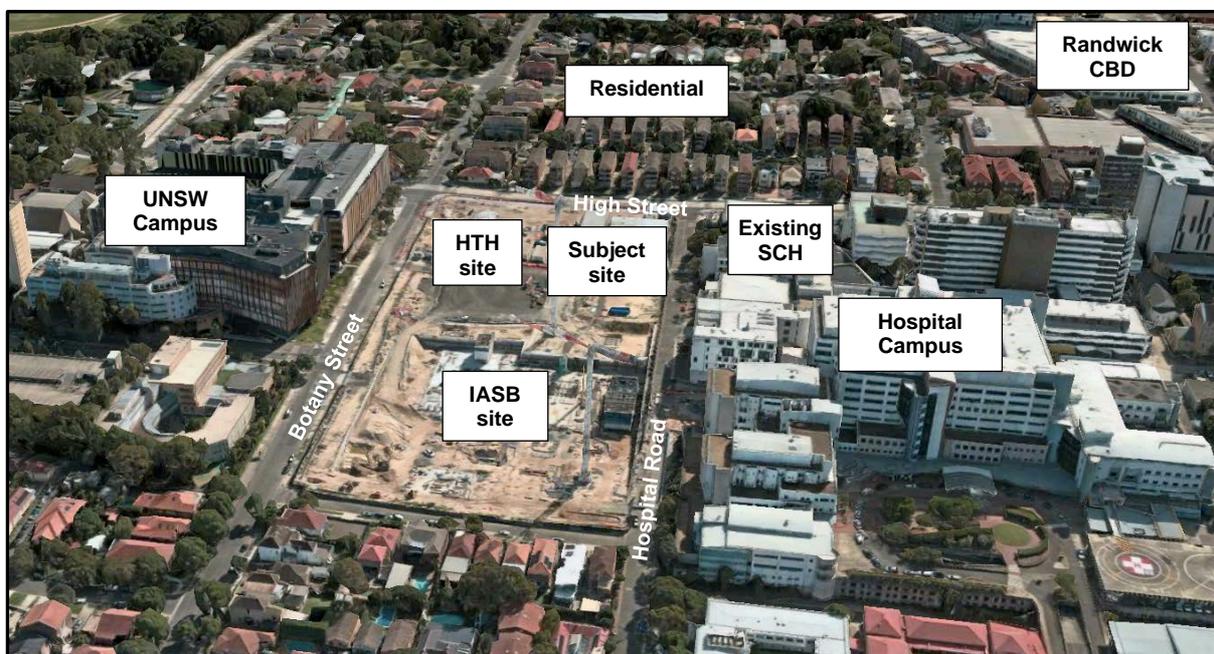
| Aerial photo of site and surrounding development (Base source: Apple Maps)
